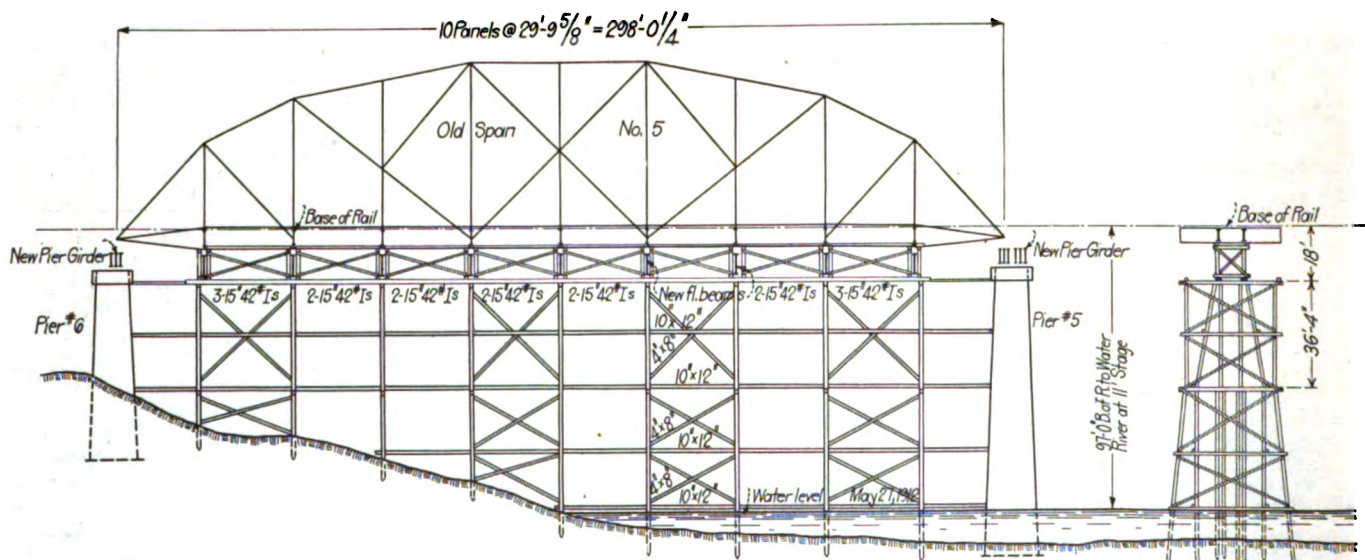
False Work Used in Erecting End Spans Showing Pony Bents Supporting New Floor Beams.
